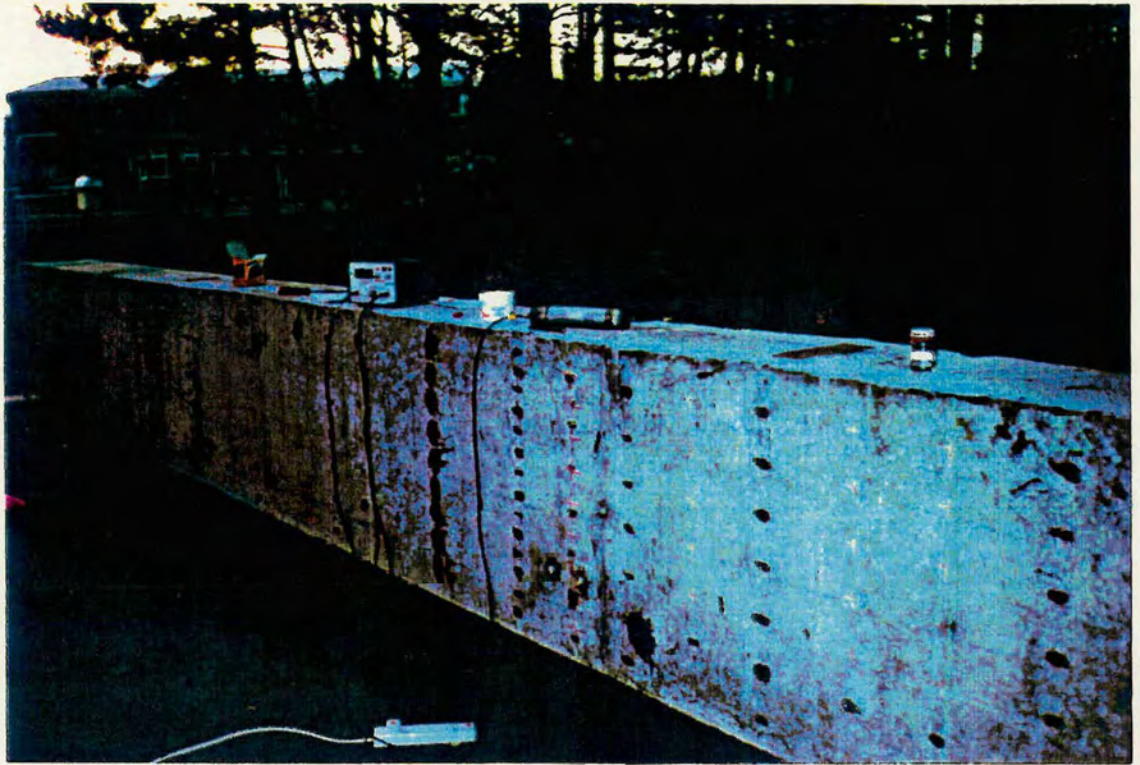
Test set-up for tomographic testing (on TRL test beam)
